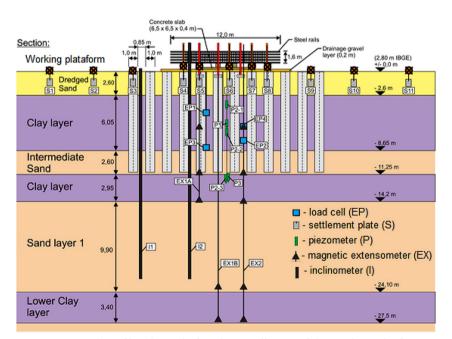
Soil profile adopted after the installation of the working platform and stone columns with the instrumentation positions (Almeida *et al.*, 2014).
